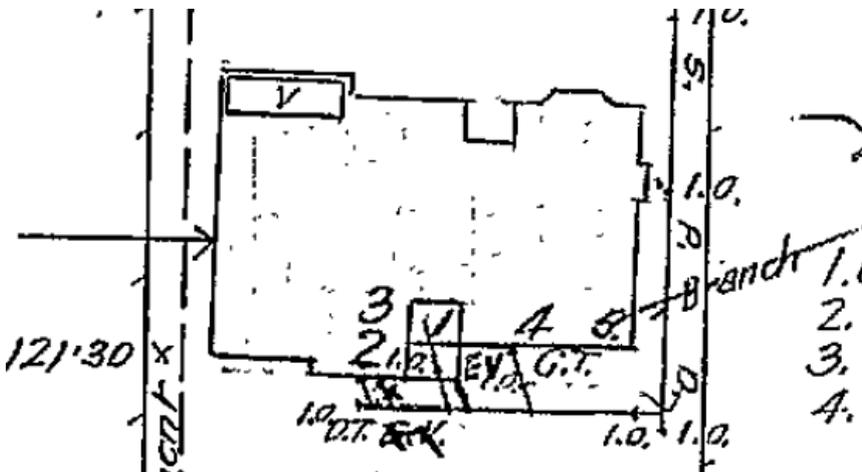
Plan of Drainage (no.109835) dated 1918, showing footprint of the house. (Source: South East Water)
